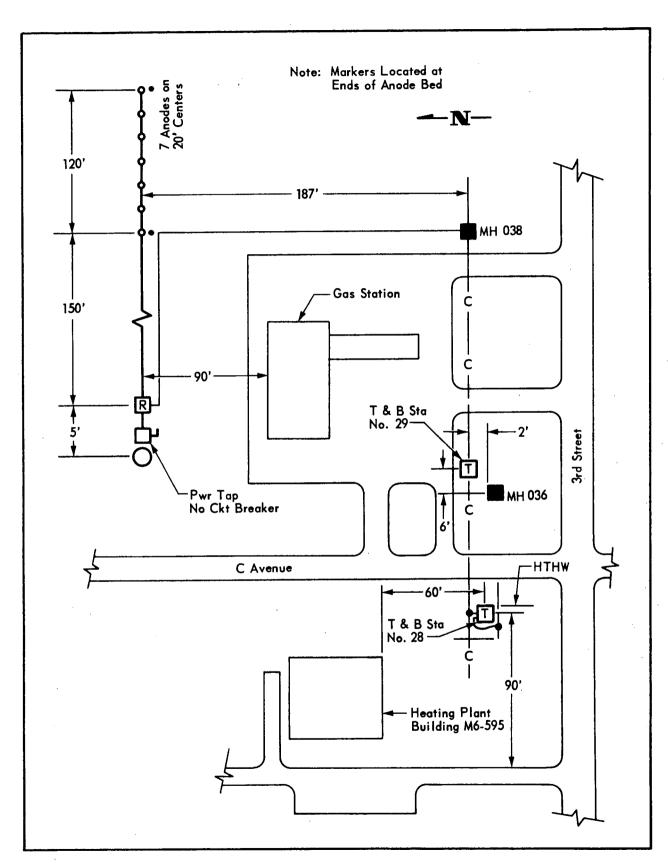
Site No. 30 and Test and Bond Stations No. 28 and 29 Equipment Locator
